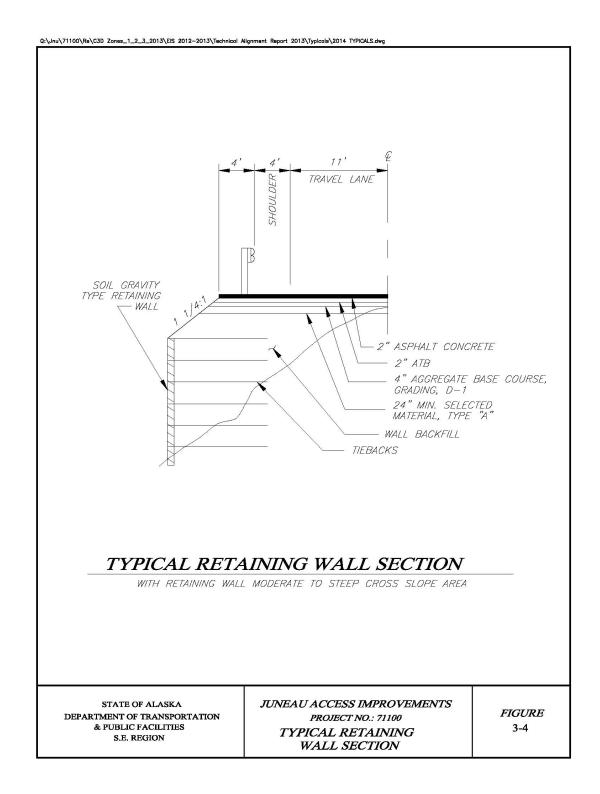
Typical Retaining Wall Section (Moderate to Steep)
